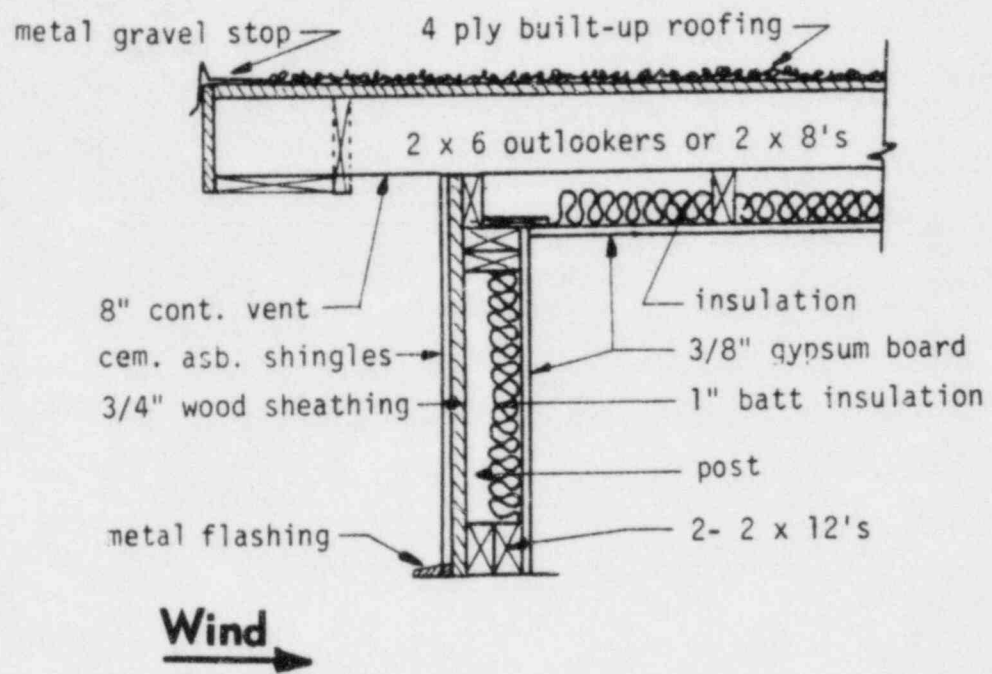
Windward roof-wall detail of the Recreation Building at section B.
